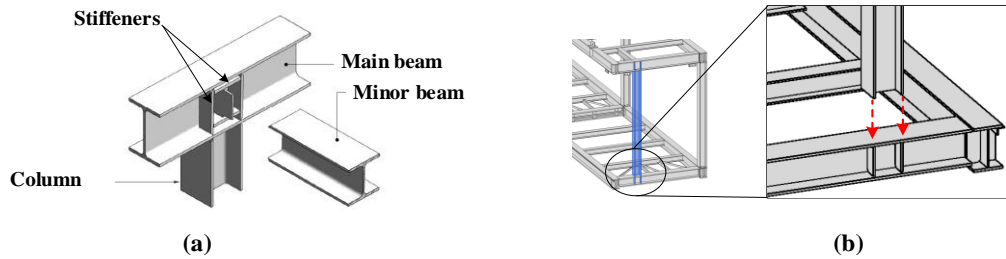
Used connection in case study project: (a) connection between column & beam, (b) stiffeners' location as a reference point for column fit-up.
